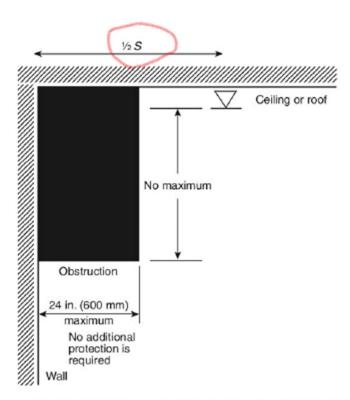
(c) Obstructions Against Walls (SSU/SSP).
